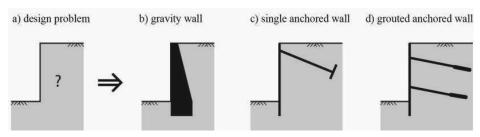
Different topologies for a design problem a): b) gravity wall, c) single anchored wall, d) grouted anchored wall
